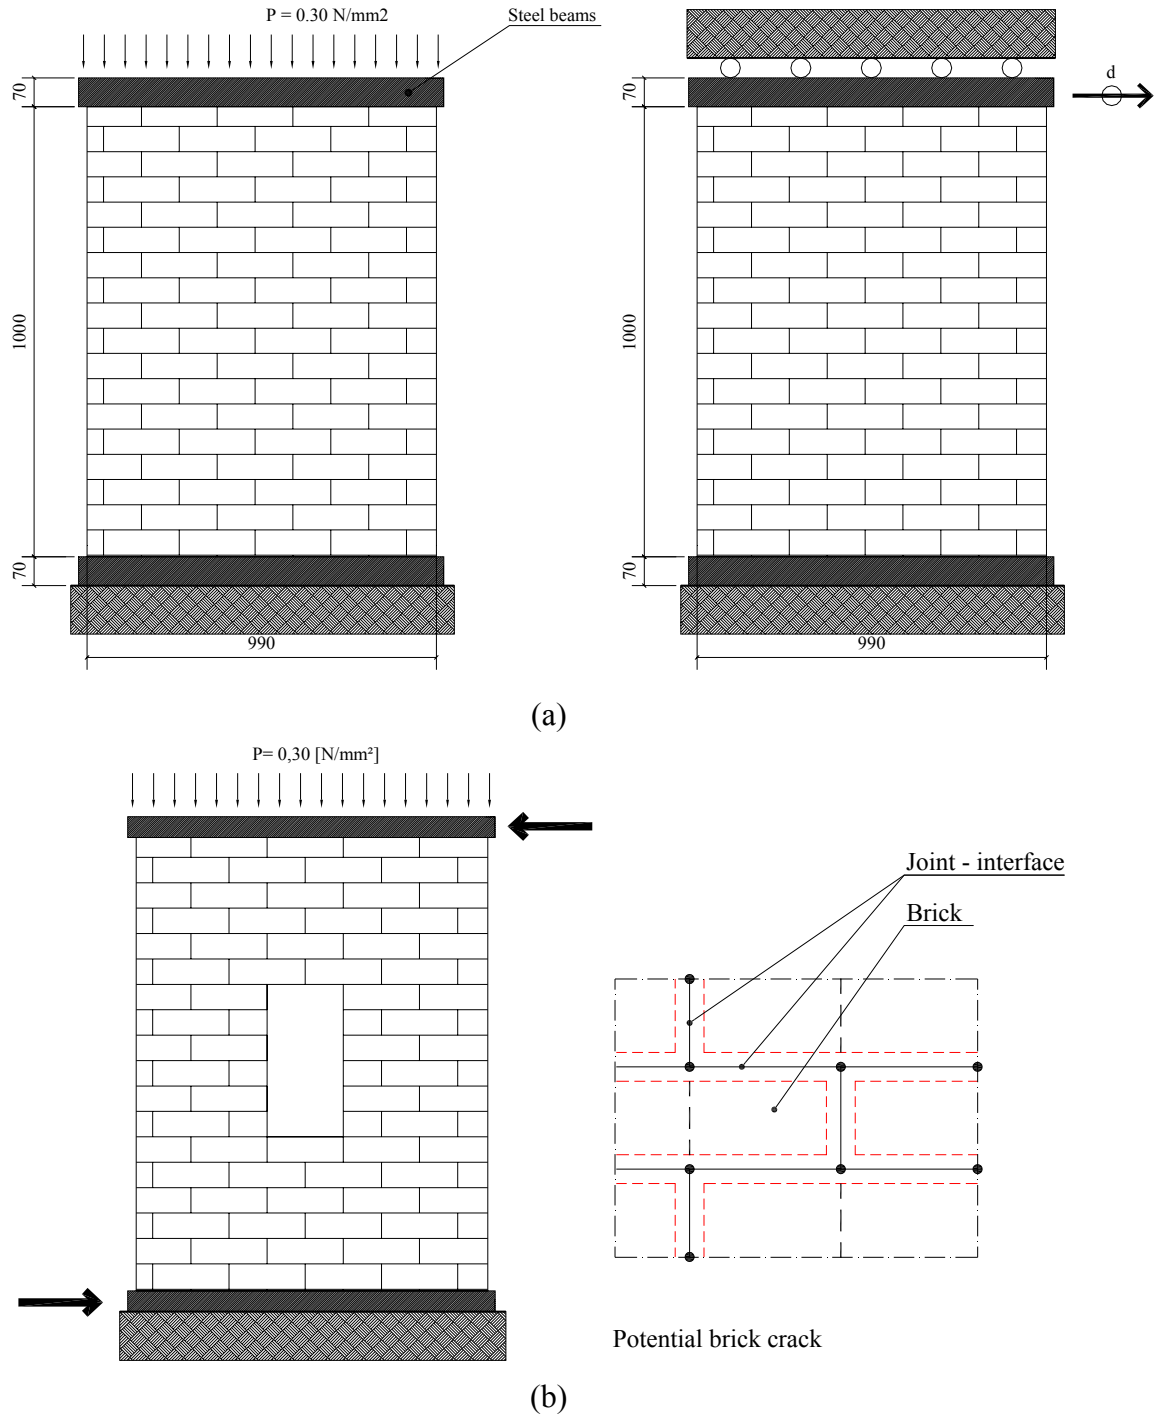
Test setup, geometrical configuration and mesh strategy for: (a) solid wall; (b) wall with opening
